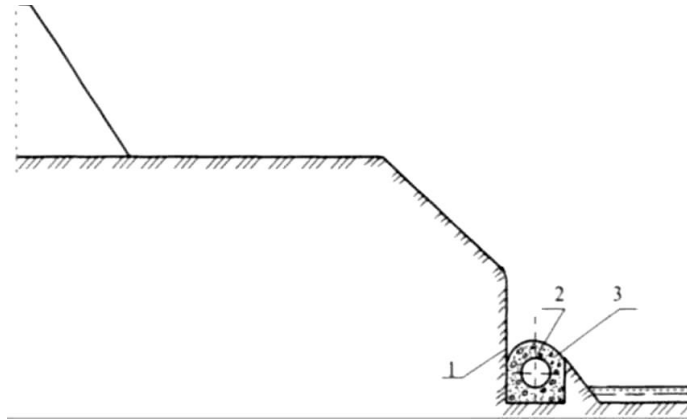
Construction of semi-mechanized closed horizontal drainage:
